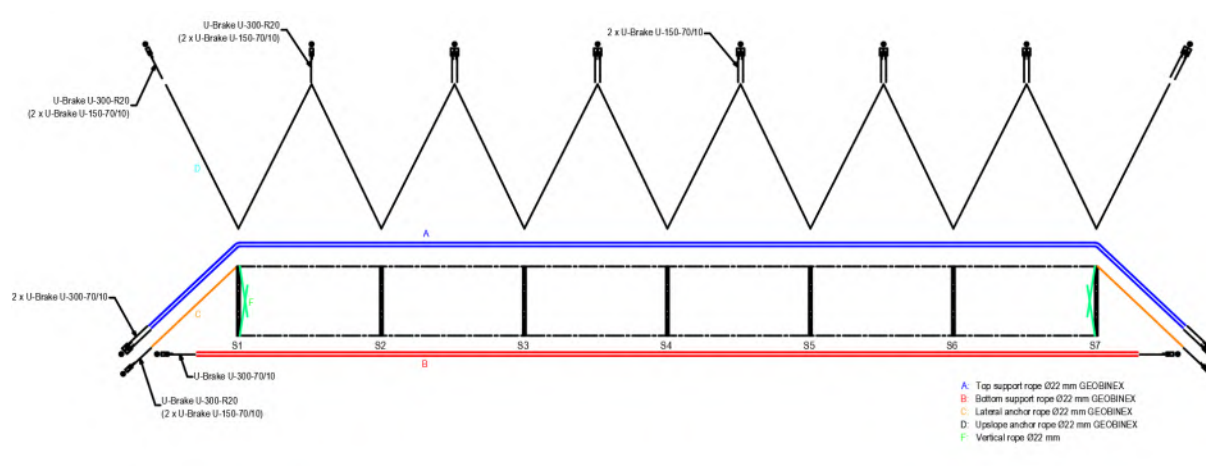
Elements of the Chant Sura rockfall protection system. For details, a full size figure can be found in Appendix A.
